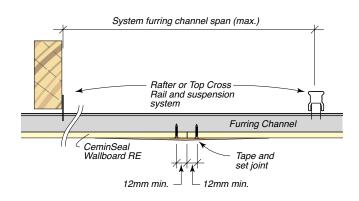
Flush-Set Jointing – Internal System Recessed Edge. (Refer to the JOINTING section in this guide for more detailed information)
